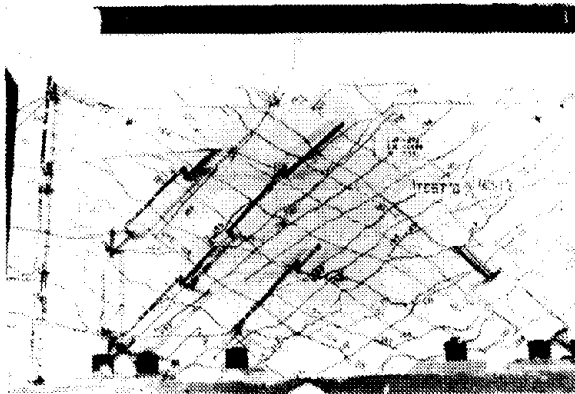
Crack Pattern at $\mu = 3$ for Rectangular Wall (Cyclic Loading), Specimen 6
